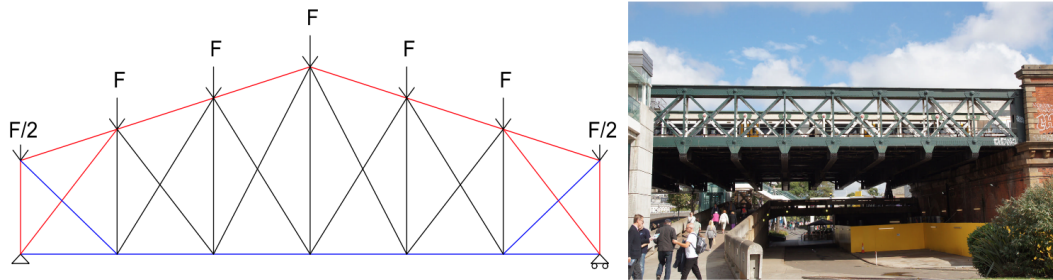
Brown truss scheme and application example: Hungerford railway bridge
